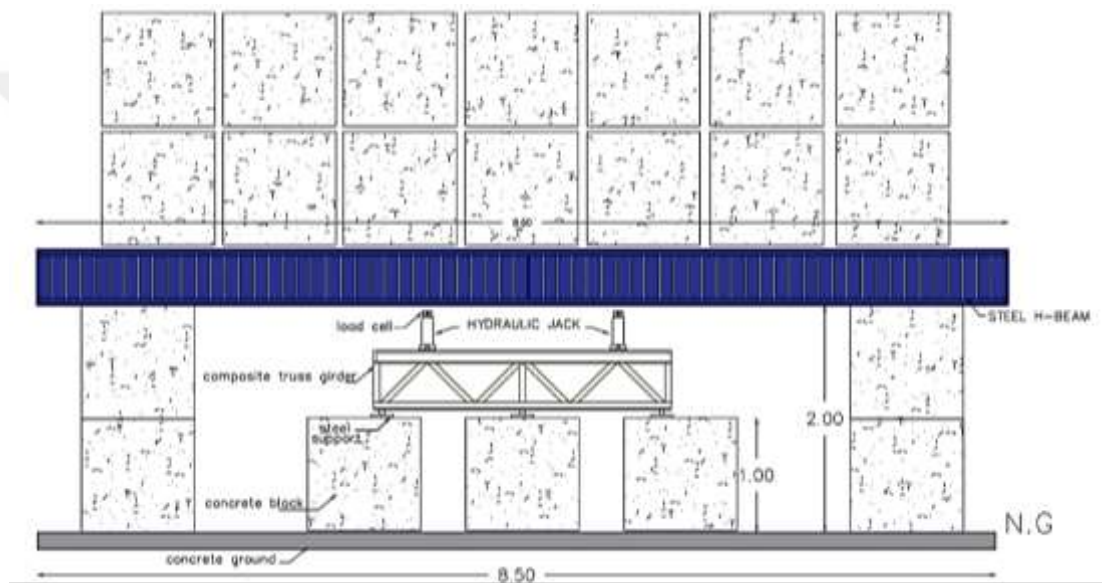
Hydraulic Machine and Load System Design Sheet
